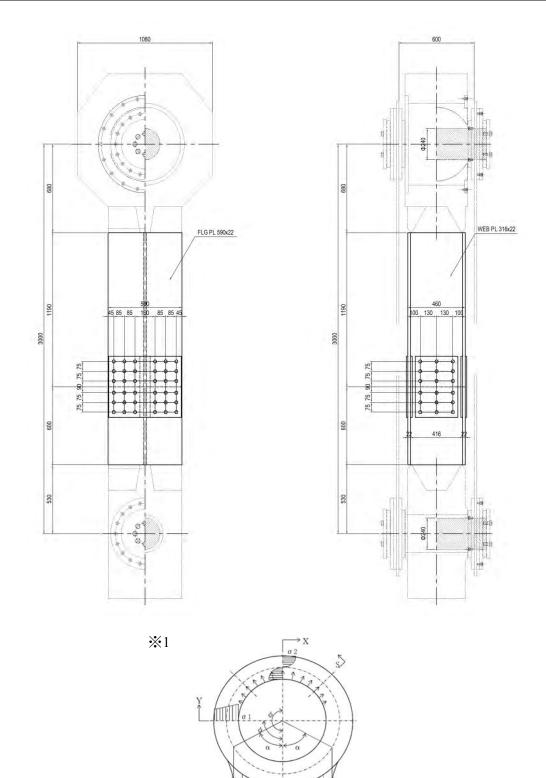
Rocking Bearing Overview and Cross Section Location
